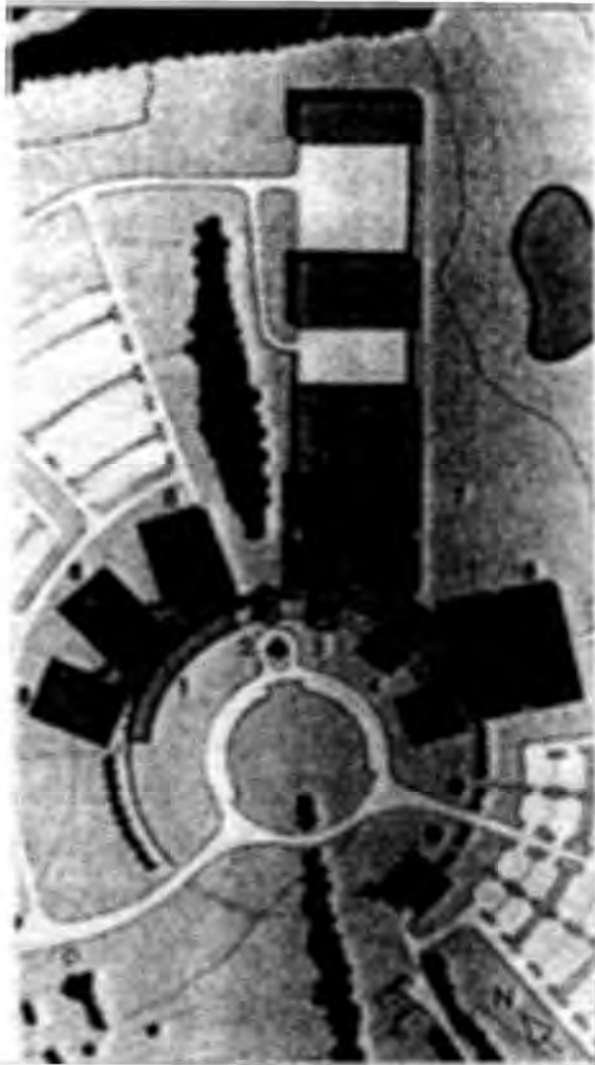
Site plan of Schlumberger Cambridge Research Centre
